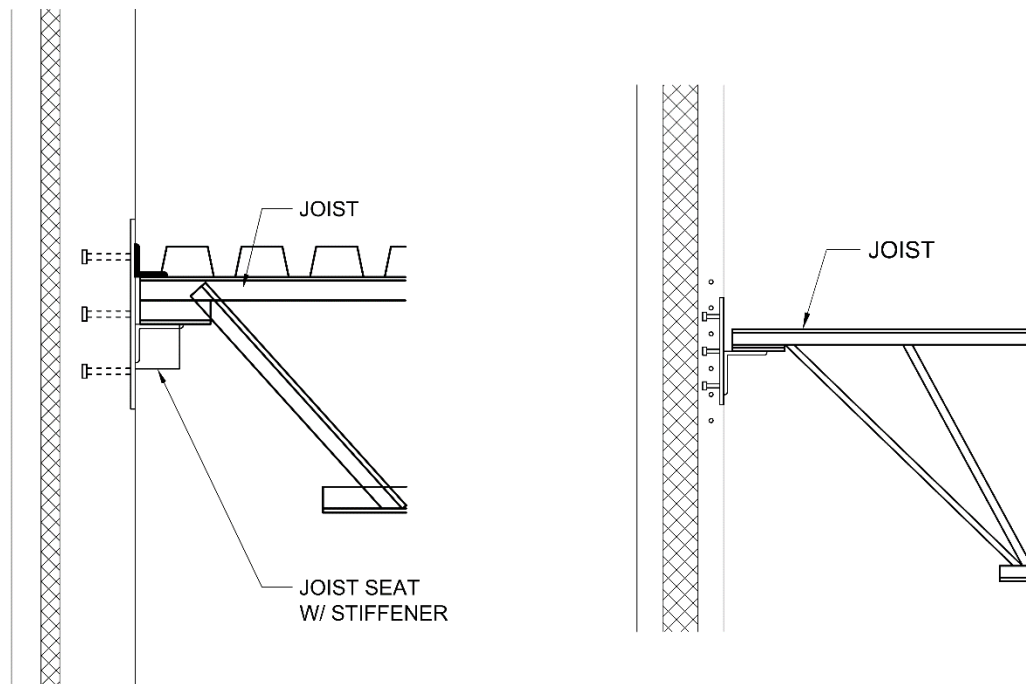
Sample roof termination details where embedment plate does not puncture or reduce insulation
